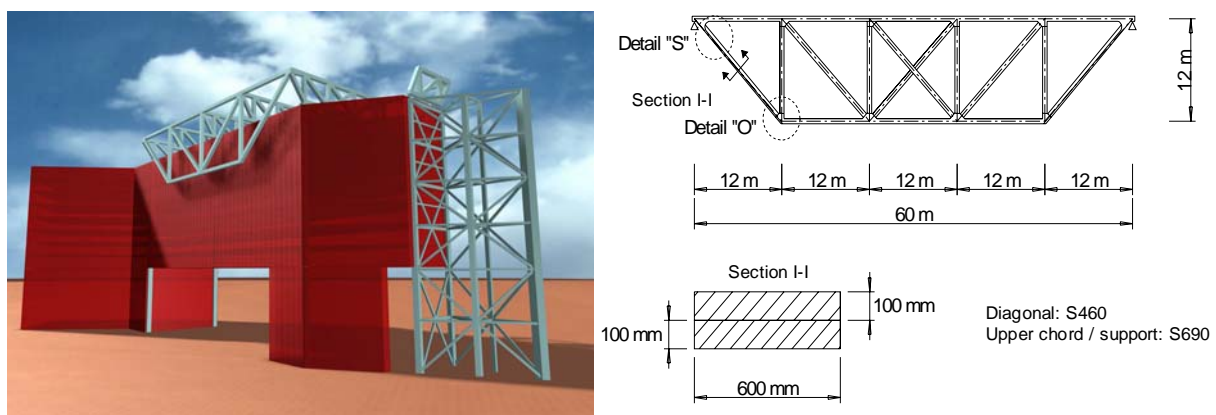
Overview on the roof structure of the Sony Centre in Berlin, Germany [4]
